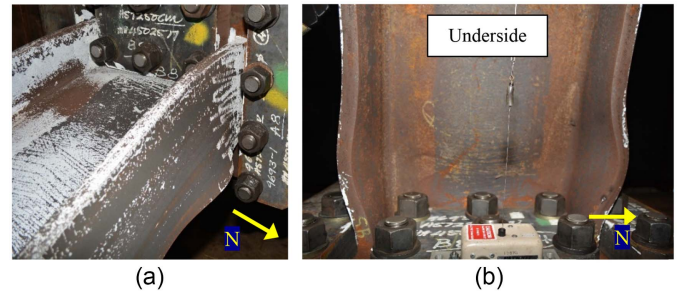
LTB-induced flange local buckling (Specimen 16M): (a) northwest flange; and (b) west end.
